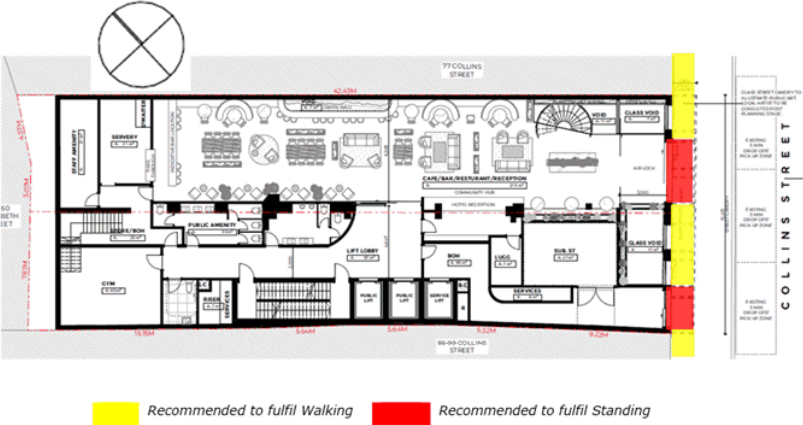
Ground level plan of the proposed redevelopment with the recommended wind criteria overlaid.
